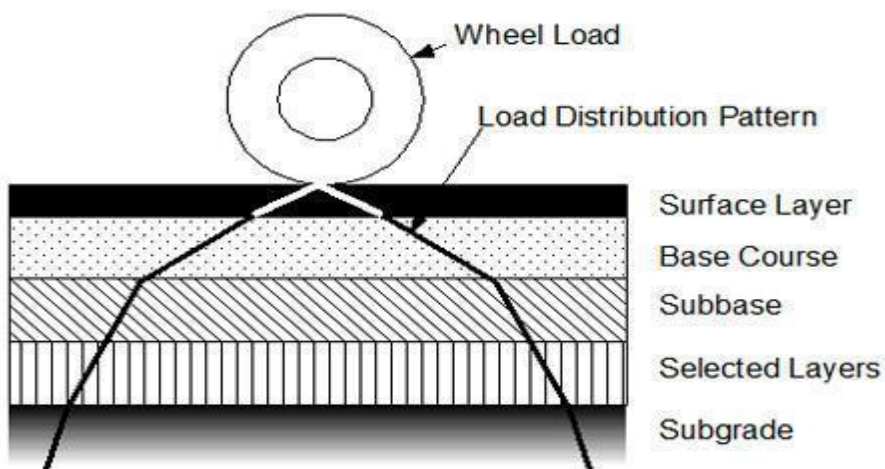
Load Distribution of Flexible Pavement (Adlinge and Gupta, 2009)
